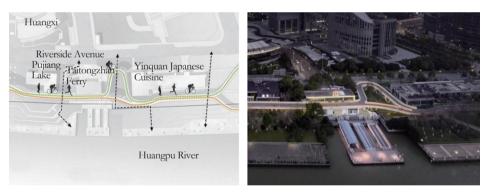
Slow bridge blending seamlessly with the buildings at Taitongzhan Pier
